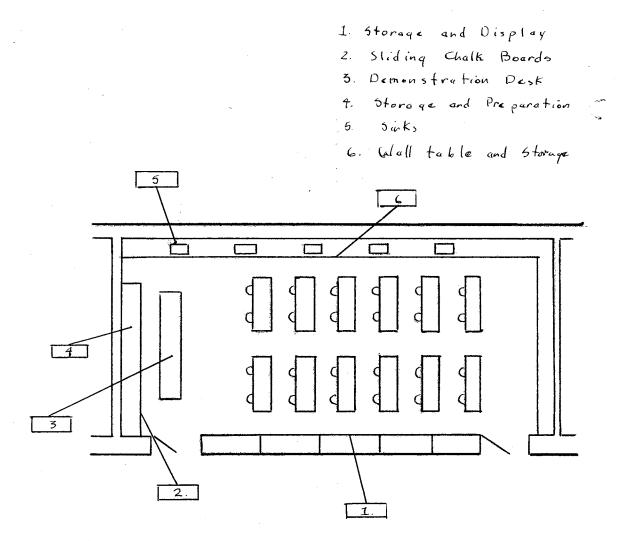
Floor plan for classroom laboratory This is the floor-plan of Biological facilities at the Booker T. Washington High School, Tolsa Oklahoma. Utilities are available only on wall tables and demonstration desk.
